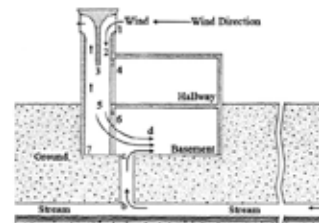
Section of Badgir with underground stream (Bahadori and Dehghani-sanij, 2014)
